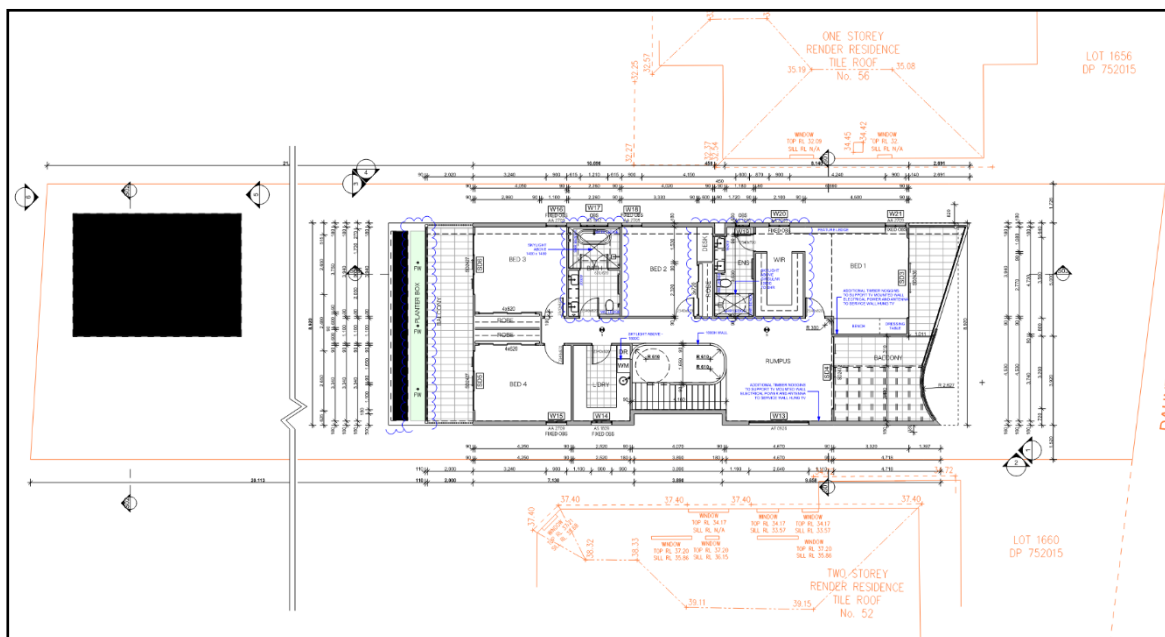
Second Floor Plan - 54 Daunt Avenue (Source: Prime Design Studios)
